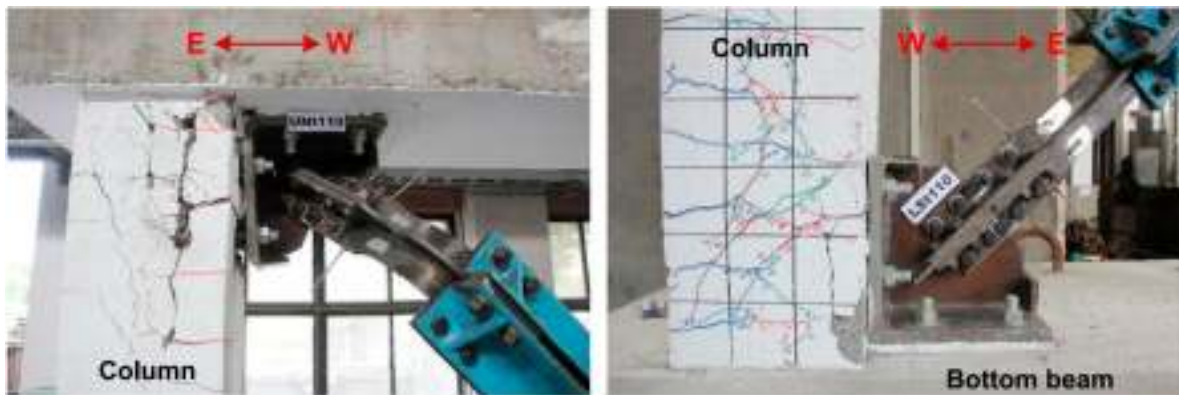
Failure of the connection of a bracing system anchored to a concrete frame.
